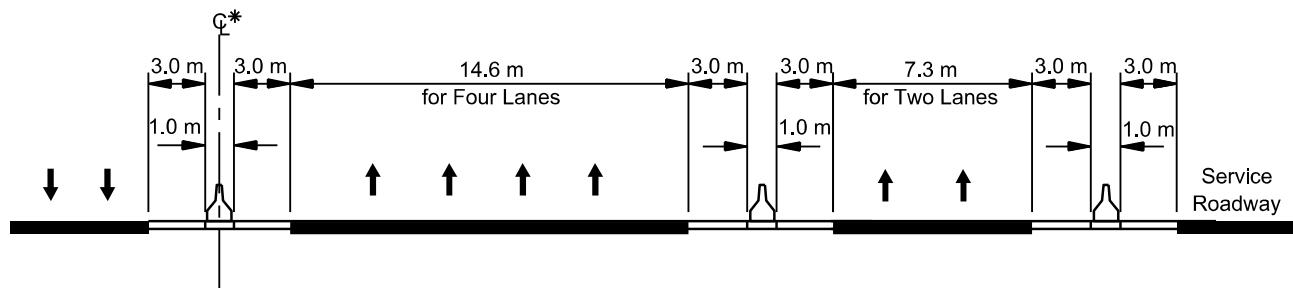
Typical Cross Sections for Reverse-Flow Operation
